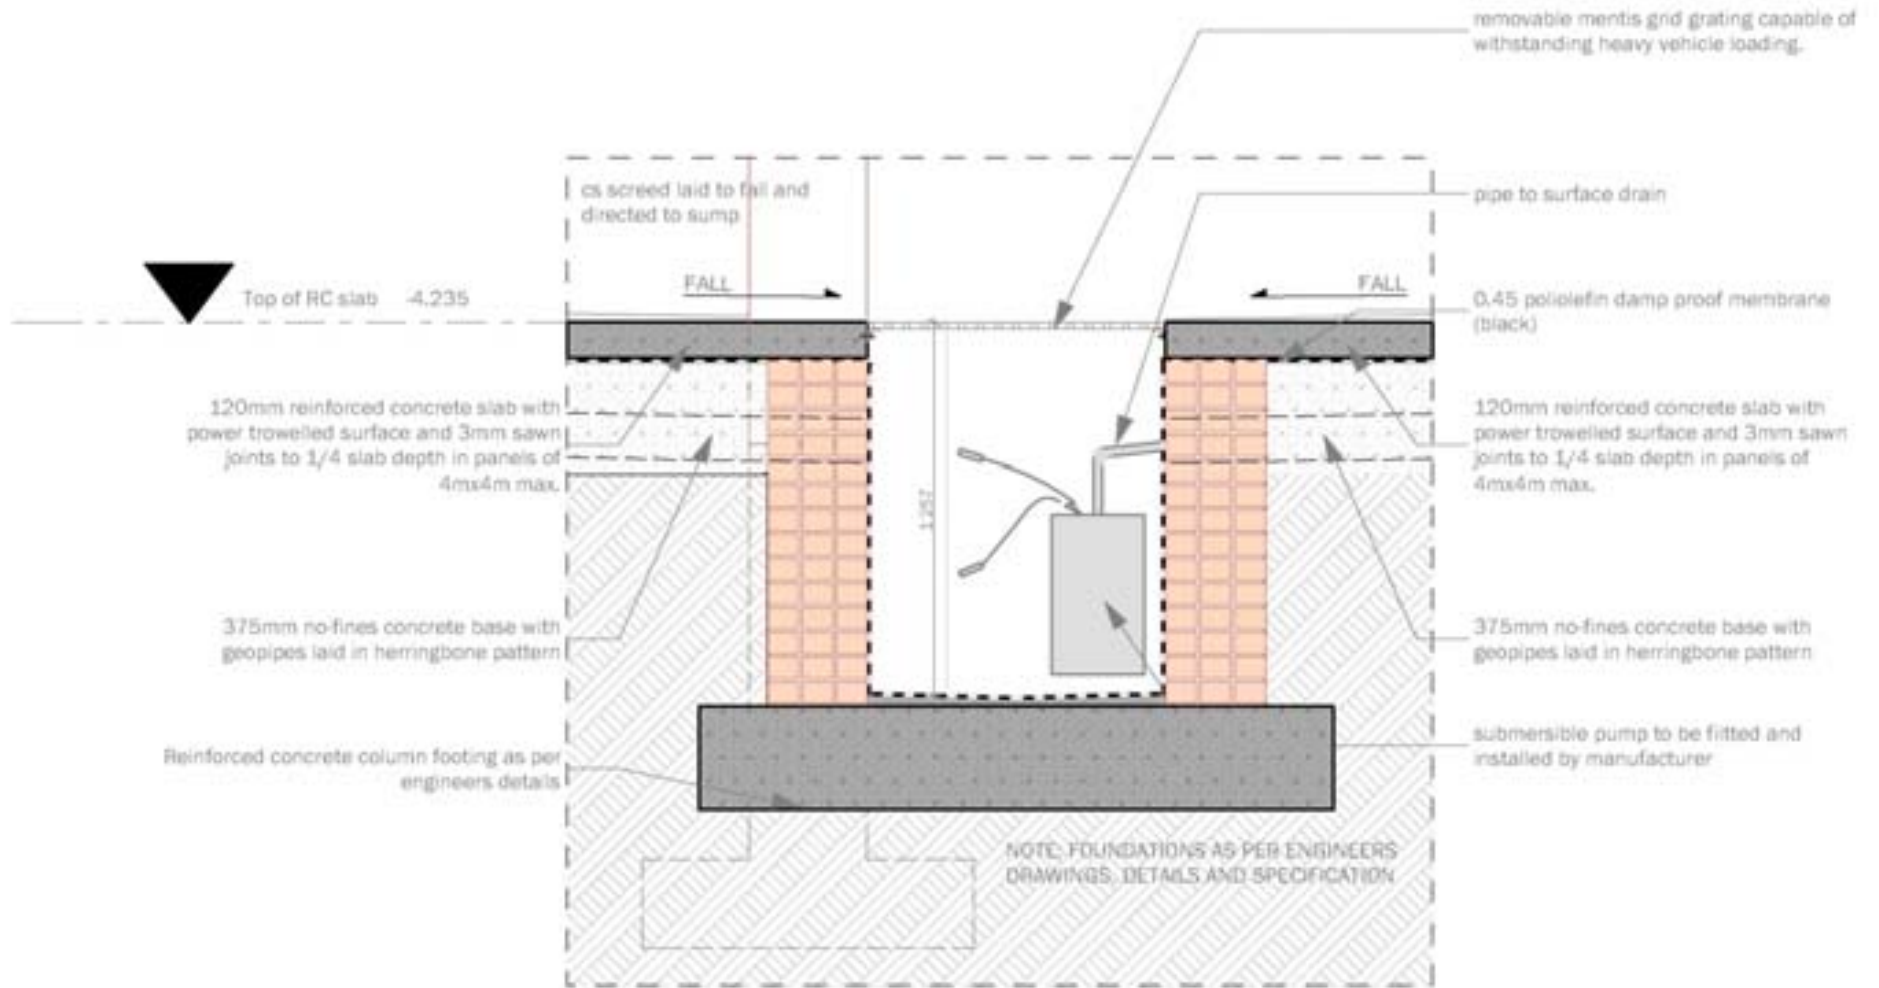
Section D-D. Scale 1:200. (Author, 2009).
